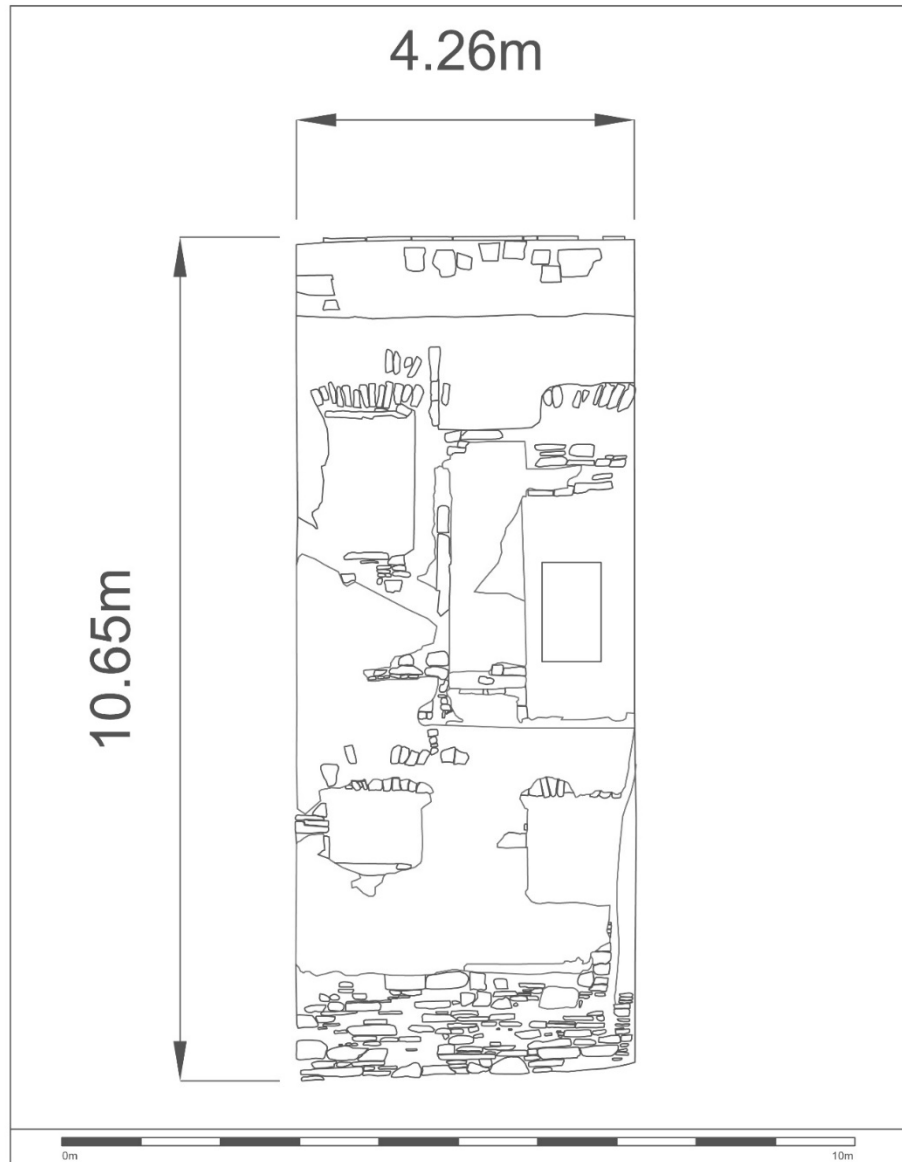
Internal elevation of the north-east wall of the signal tower at Malin Beg Signal Station.
